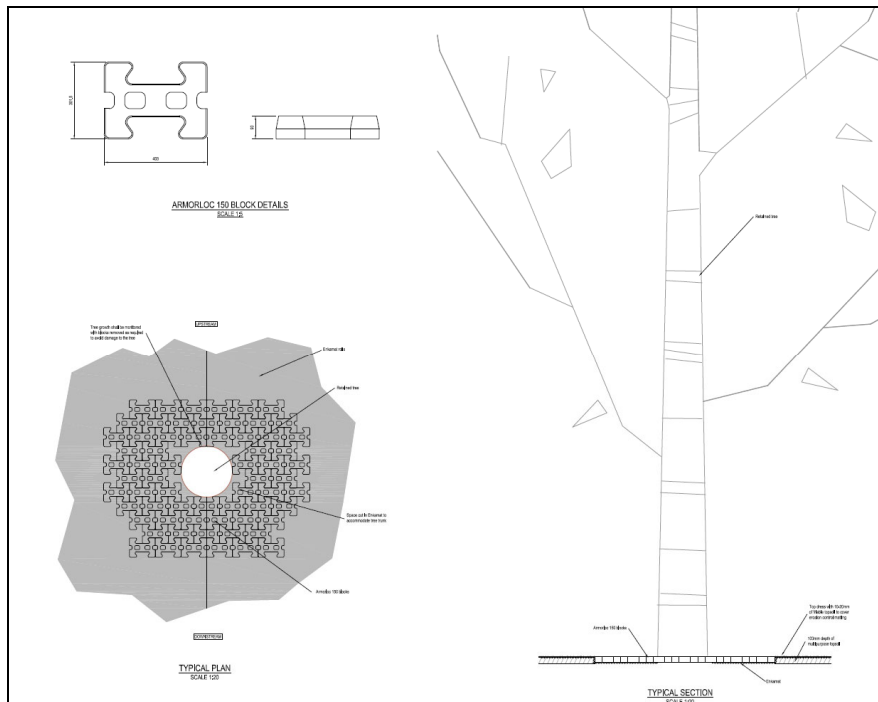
Extract from B&V Drawing Ref: 1229-18-BVL-Z0-00-DR-Z-00004 (Rev P01)
